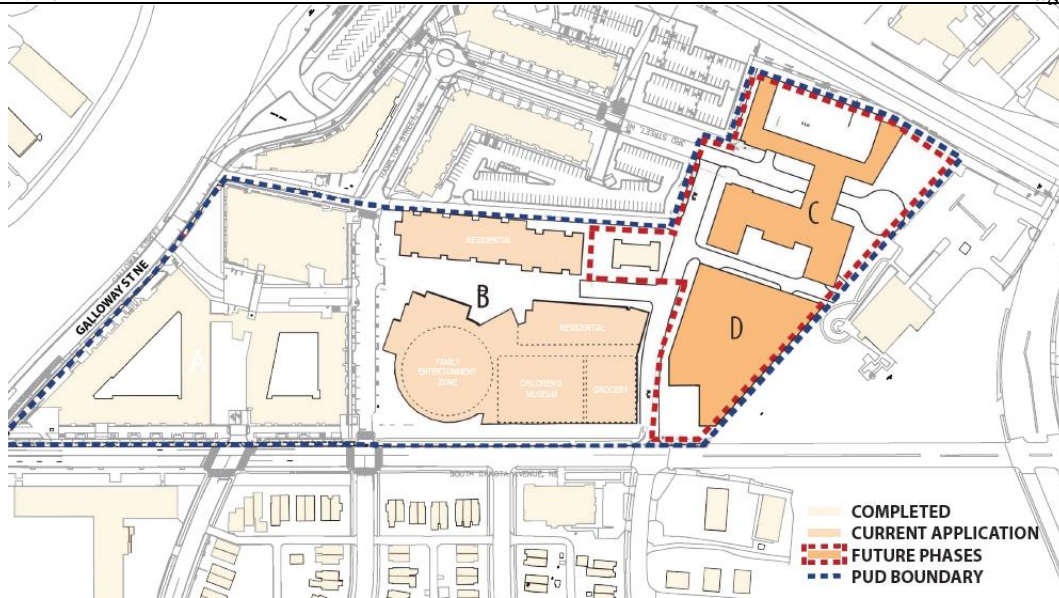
Proposed Site Plan Upon PUD Completion After Approval of Phase B
